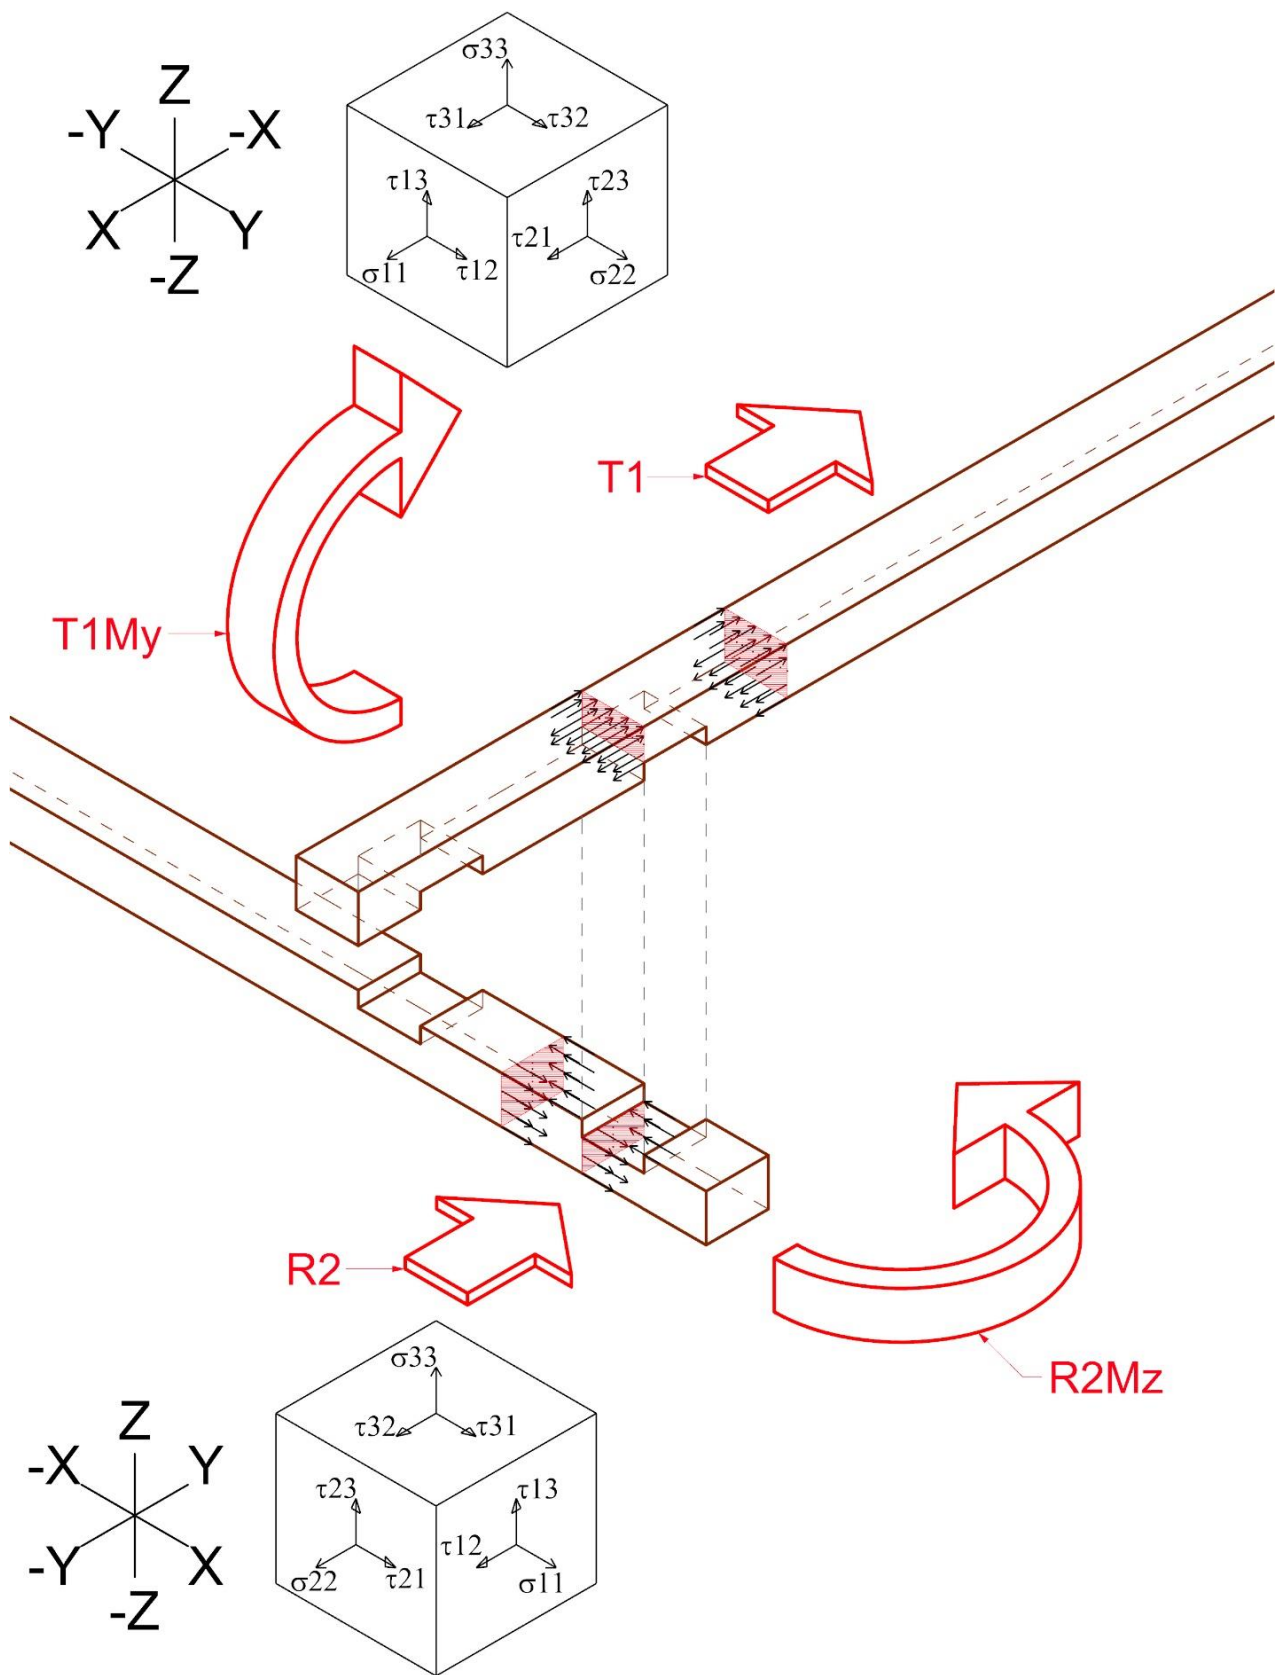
Rafter Head Bending moments: Axial stresses: Crossing rafters T1-R2
